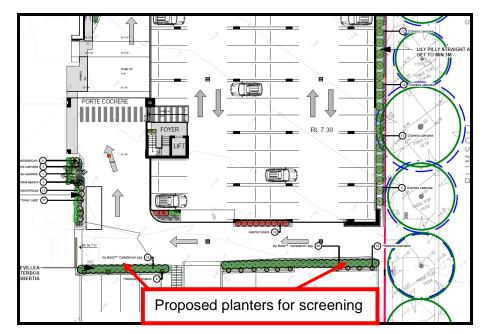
Amended Landscape Plan with landscaping adjoining the access driveway (Source: Site Design Studios, Revision D)
